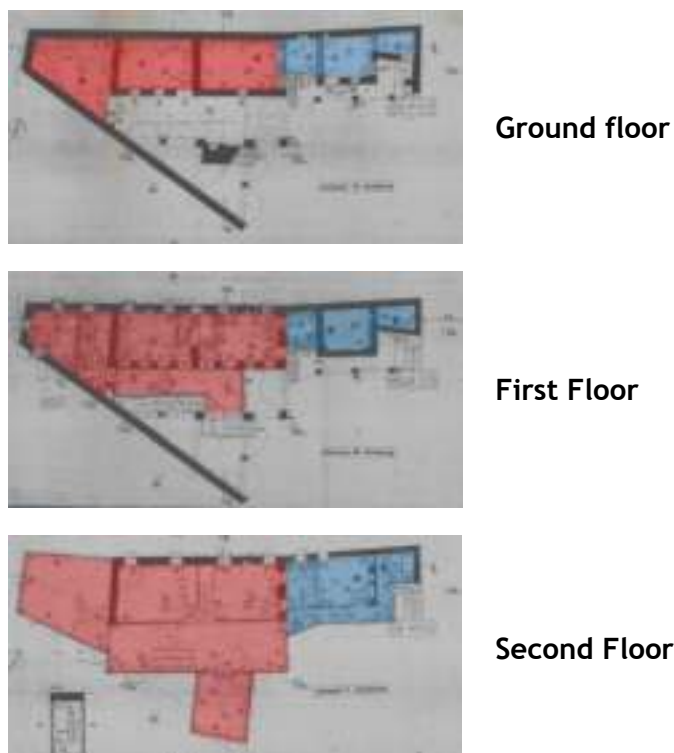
2D Plans of the building showing phase 1 (red) and phase 2 (blue) of the building construction.
